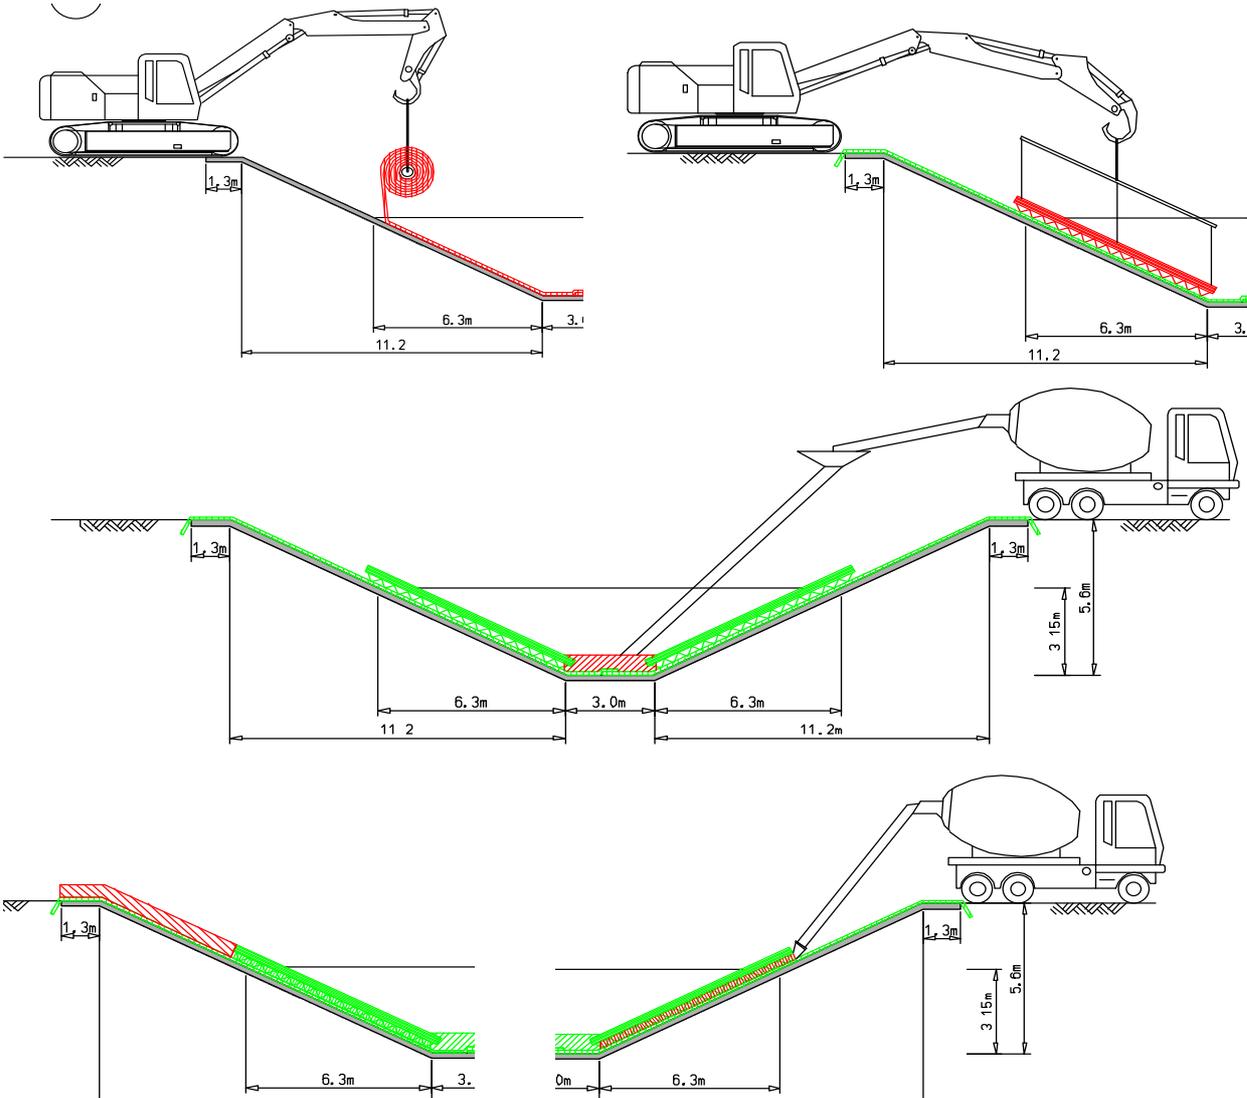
Underwater installation procedure with concrete slab facing (Ukraine, 2004)
